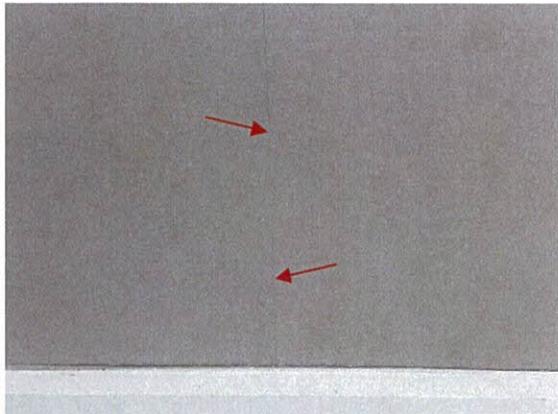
Wall crack below east window in the living room area caused by the movement of the building which occurred during the Hurricane.
